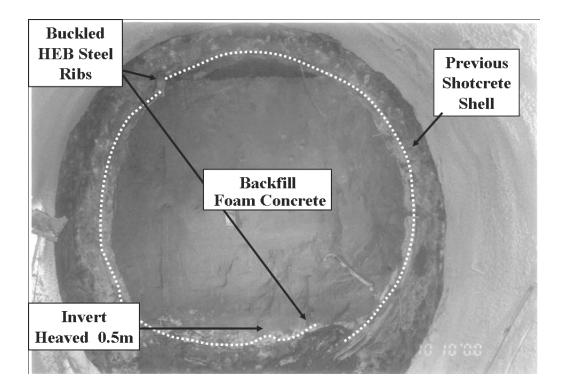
Damage observed at Asarsuyu Left Tube Bench Pilot Tunnels (after Işık and Özben, 2007)
